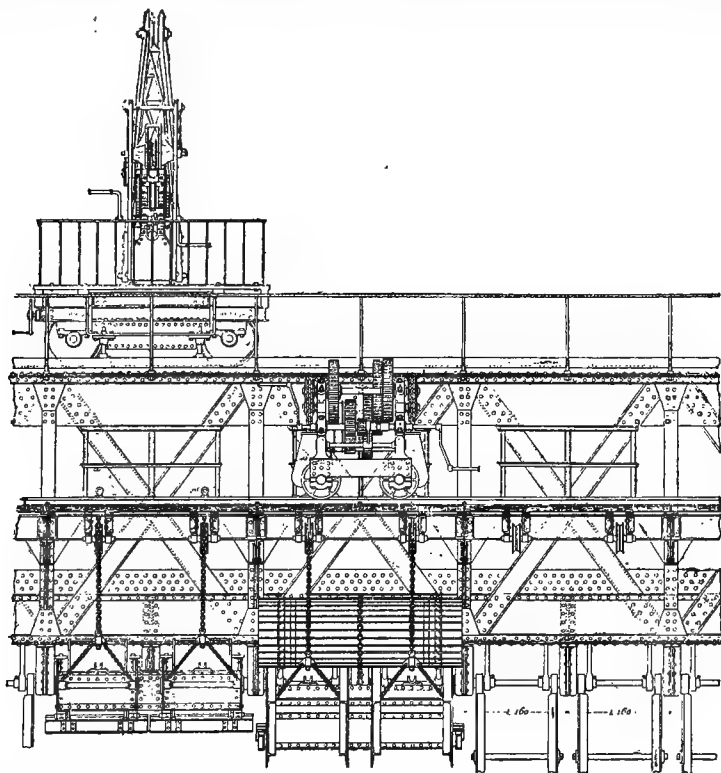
Dam at Poses. Longitudinal section along I K (Fig. 42), and upstream elevation of the intermediate girder.
